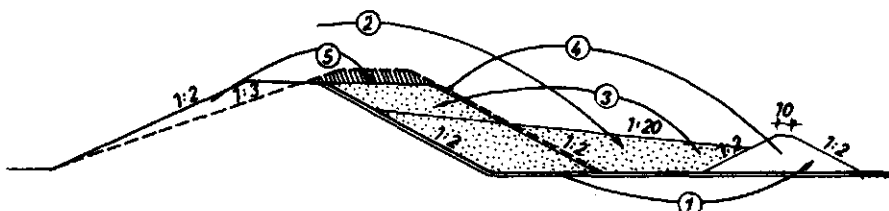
Levee reinforcement at the outside slope with heightening and slope grading at the other side
